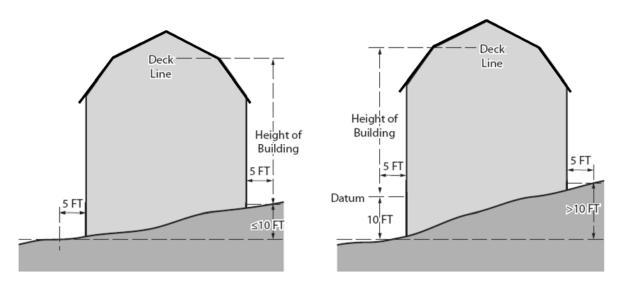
C. BUILDING HEIGHT – CURB, GAMBREL, AND MANSARD ROOF
